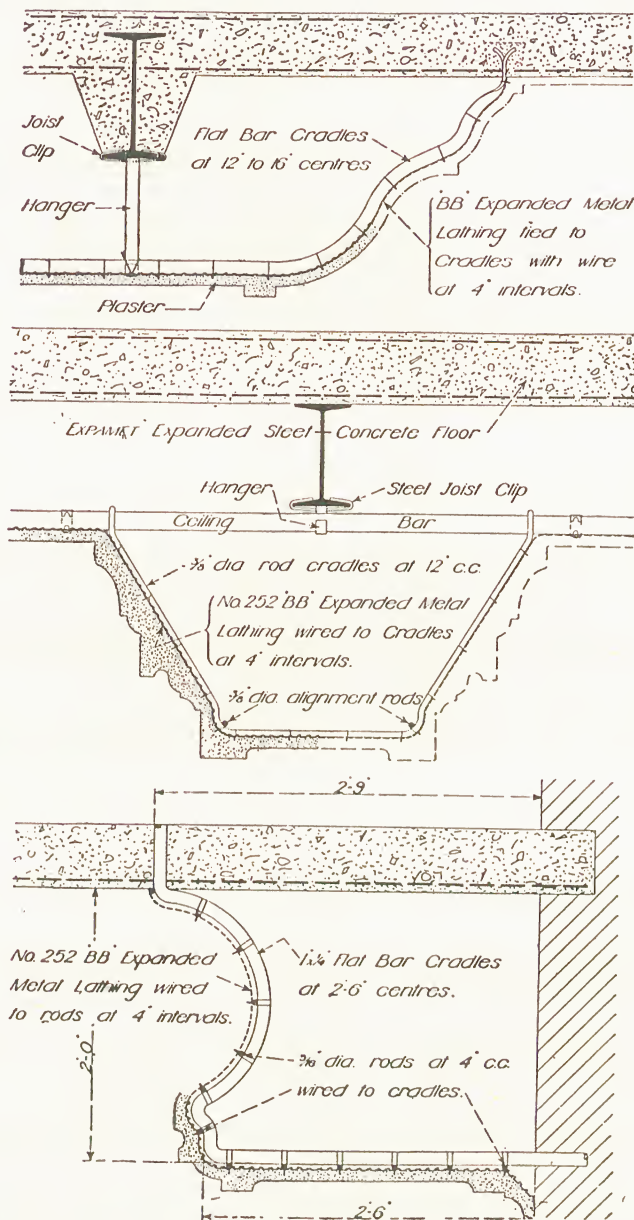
"Expanmet" expanded metal lathing used to form false beams and moulded cornices.
